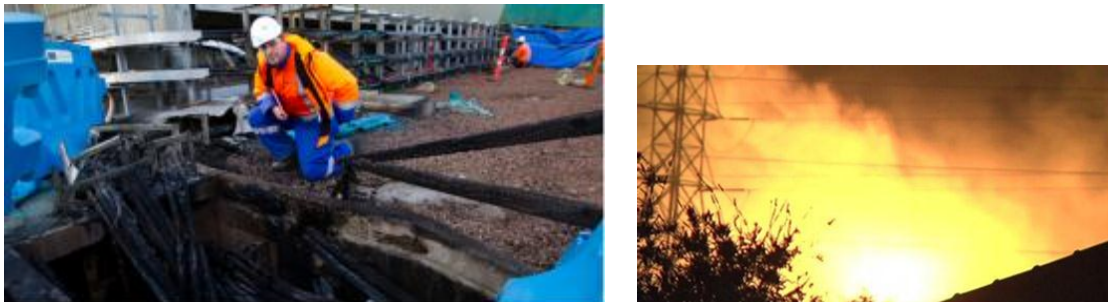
Penrose Substation – New Zealand 2014 – fire and damage following an oil filled cable fault within a substation⁷
